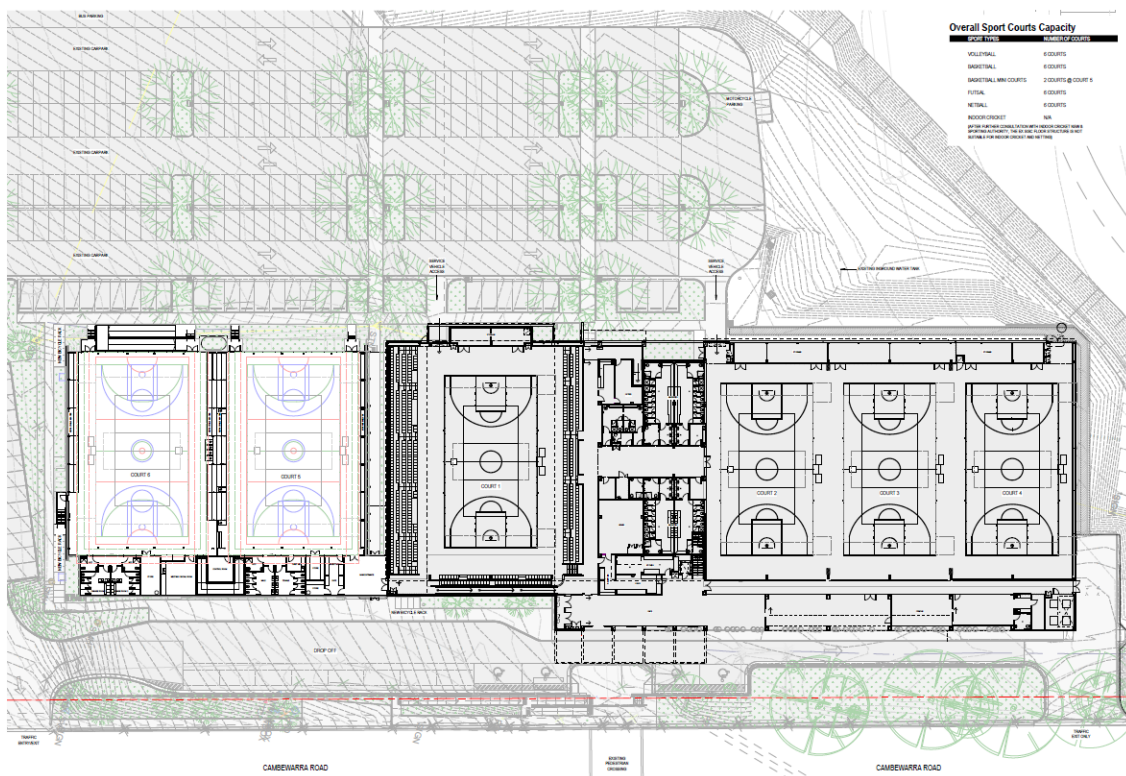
Overall Site Plan and Adjacent SISC Building (Source: CM+)
